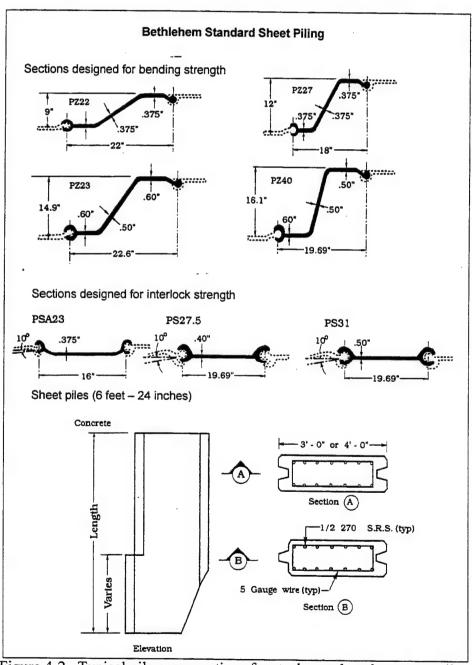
Typical pile cross sections for steel, wood, and concrete piles.
